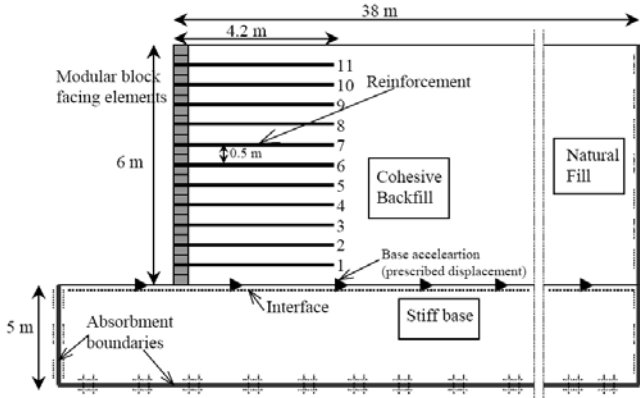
Geometry of the cement concrete block faced reinforced soil wall (Guler and Demirkan, 2000)
